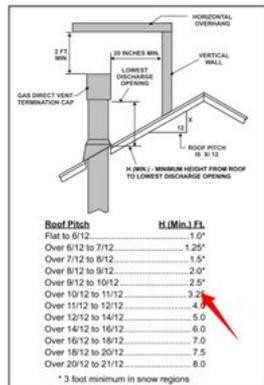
Minimum Height From Roof To Lowest Discharge Opening
